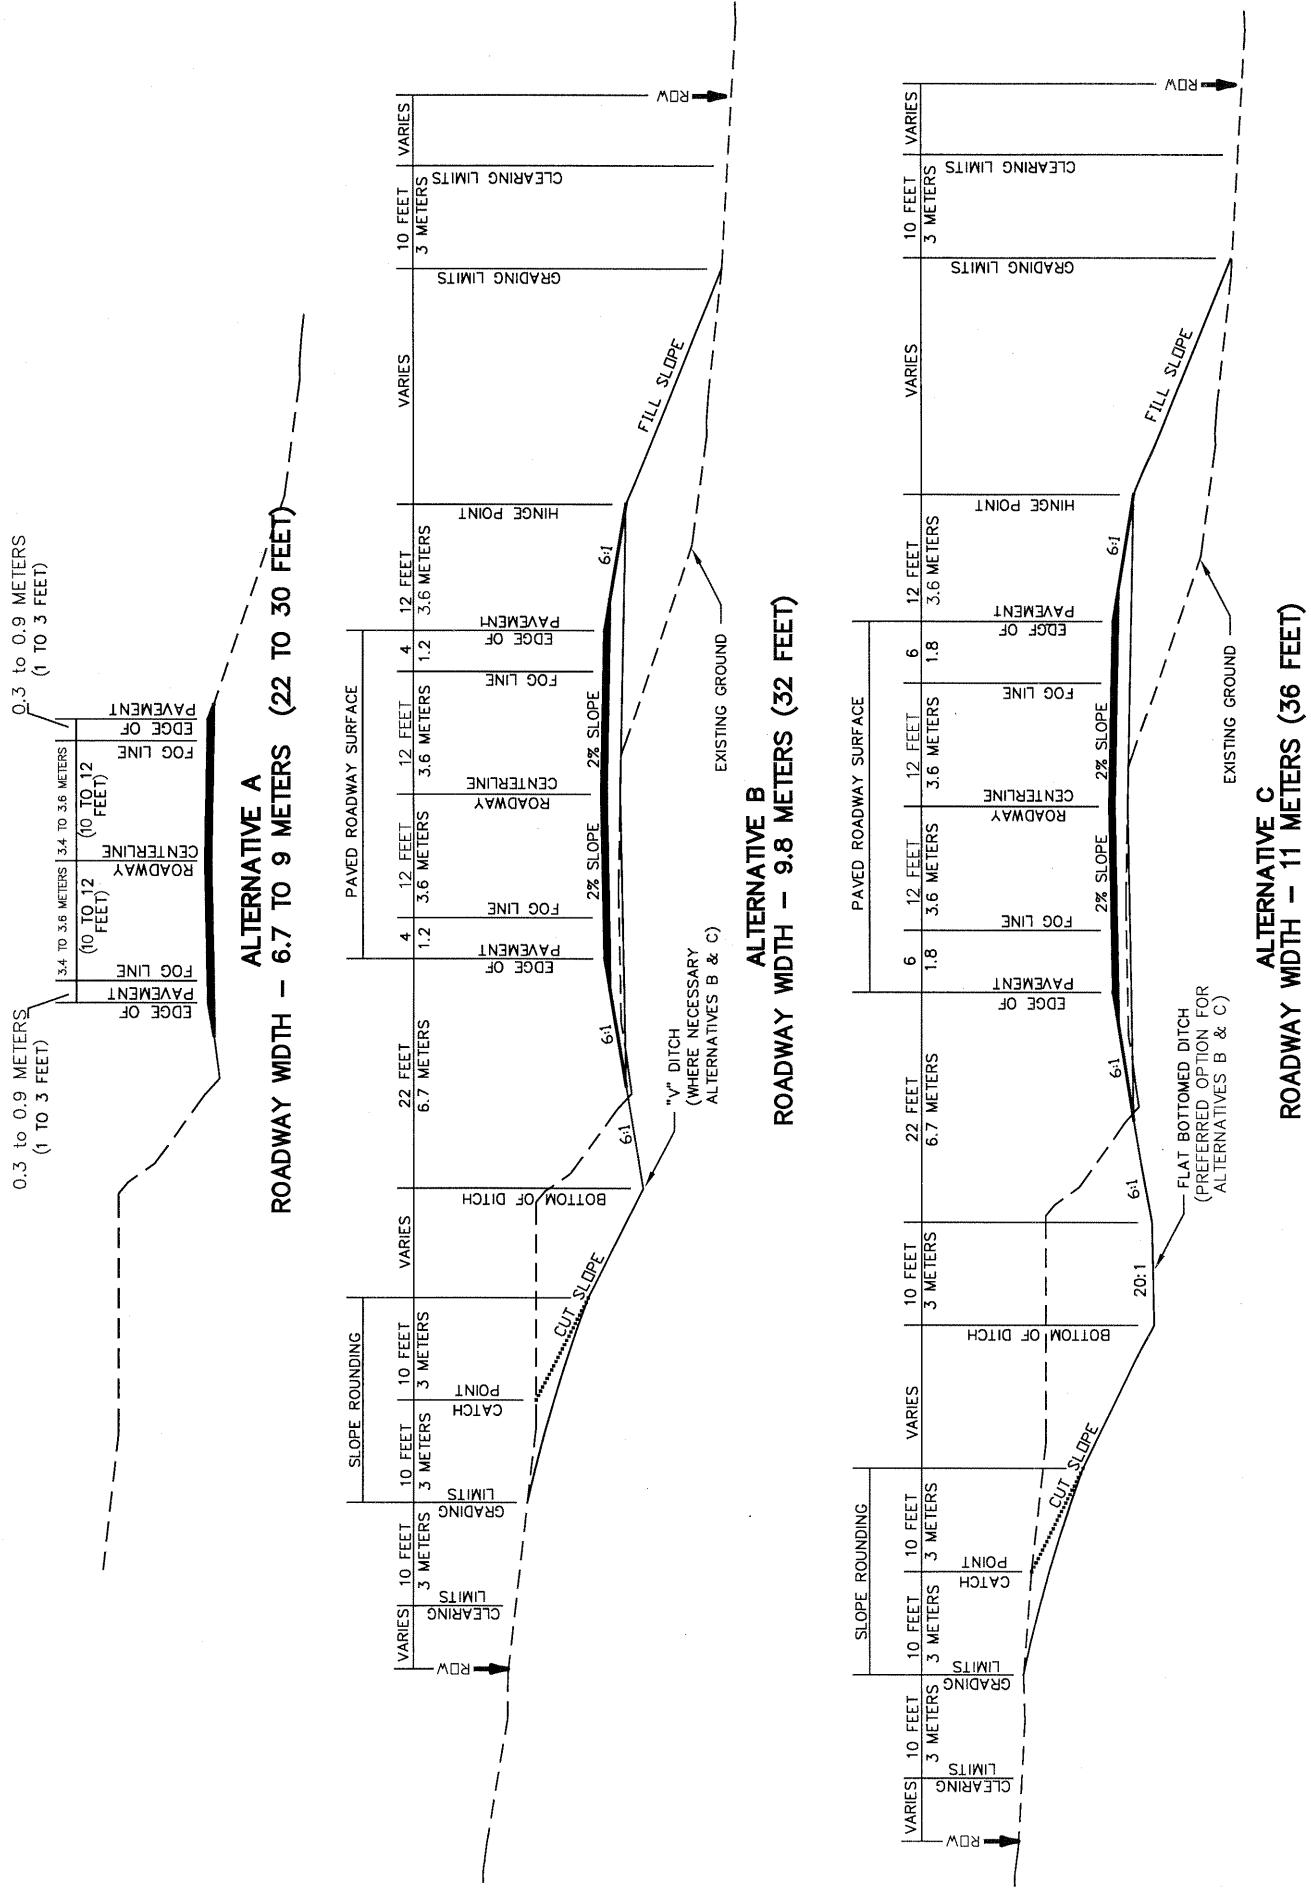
Typical cross-sections of the existing and proposed lane configurations for US 89.
